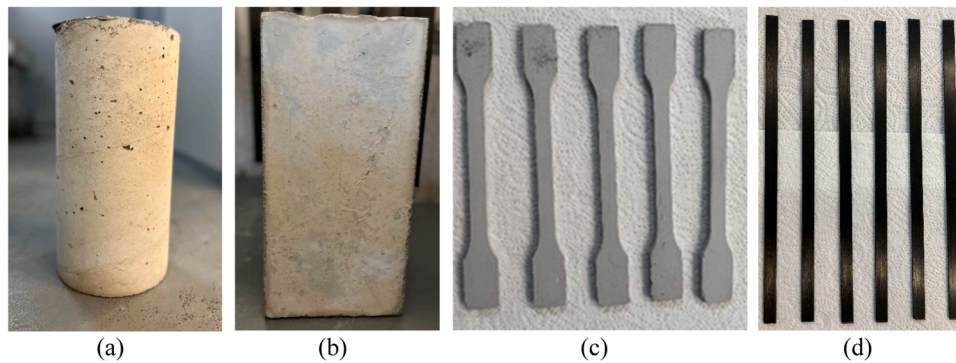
Materials specimens used: (a) concrete cylinder, (b) concrete prism, (c) epoxy adhesive dog-bone shaped specimens and (d) CFRP laminates.
